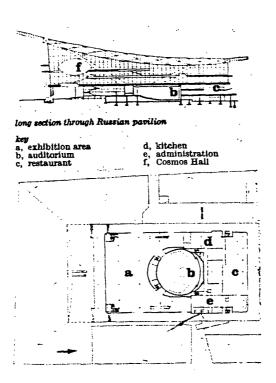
Floorplan of the Russian Pavilion [source: Architectural Review, August 1967]
